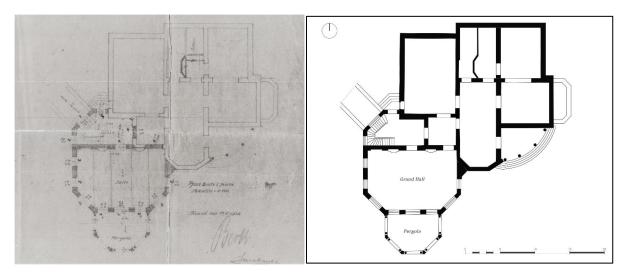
Ground floor plan by Kristo Sotiri-left (Source: AQTN) and right redrawn from (@Dorel Habili)
